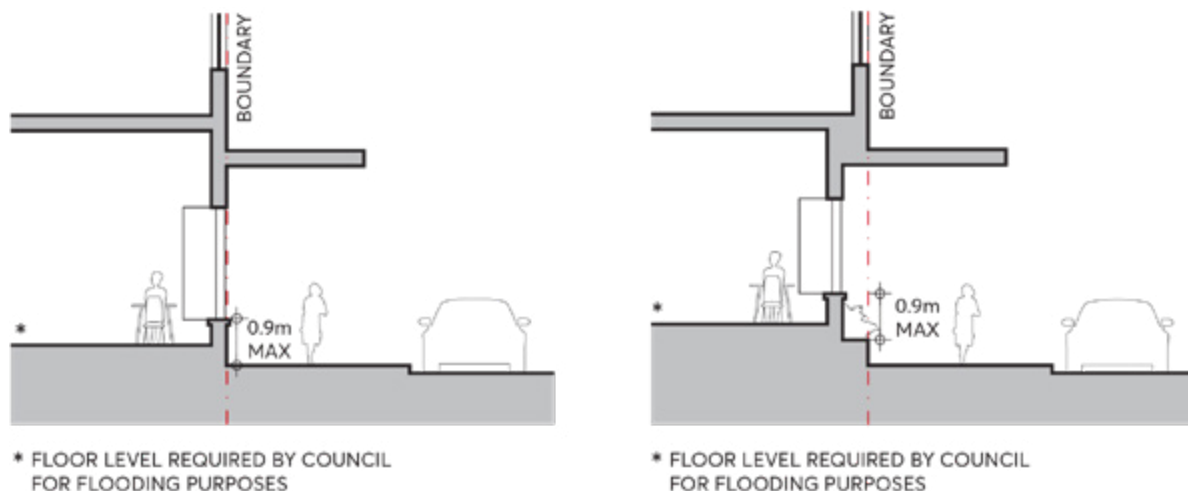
A – The Street Wall: Active frontage set back
